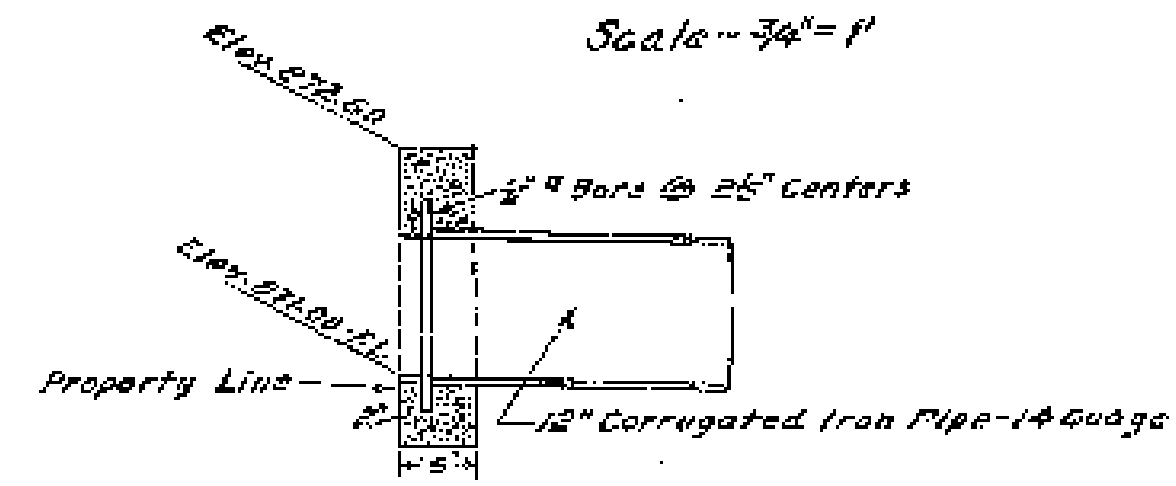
DETAILS OF CONCRETE HEAD WALL AT STA. 12+73
